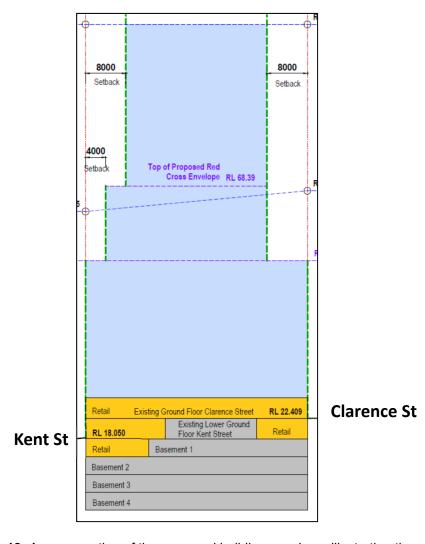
A cross section of the approved building envelope, illustrating the setbacks above podium/street wall height
